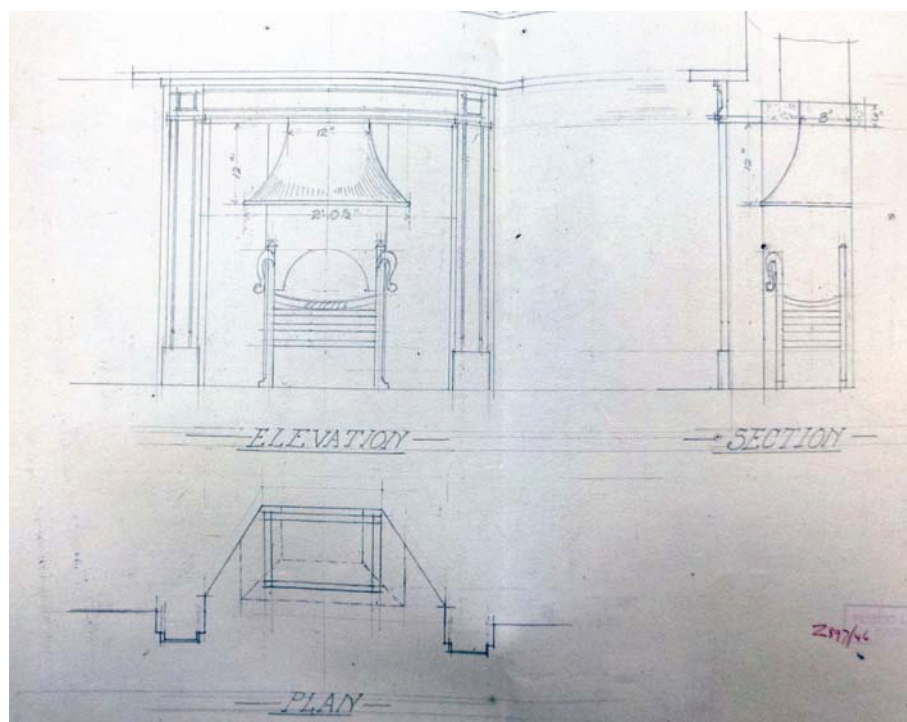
Elevation, section, and plan of proposed fireplace canopy, 1936
